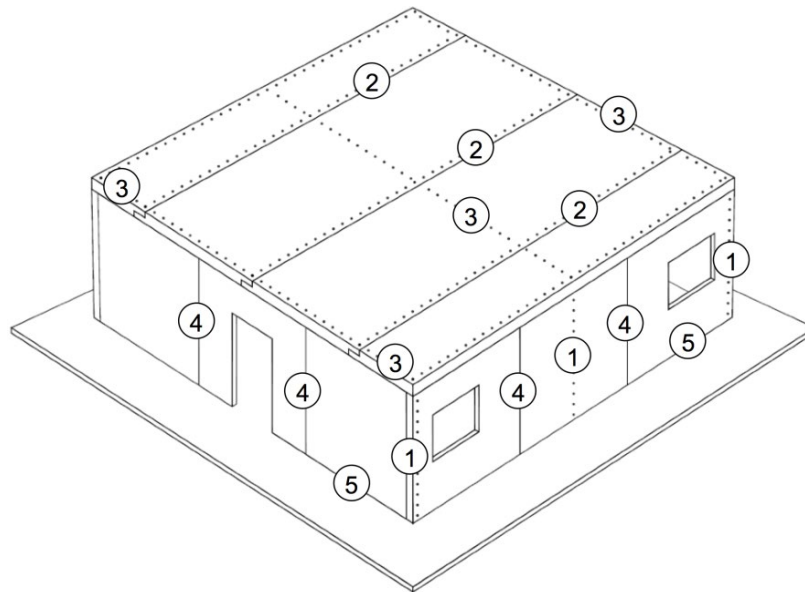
Typical storey of a multi-storey CLT structure with various connections between panels: connections 1, 2, and 3 to be elastic, 4 to be ductile.
